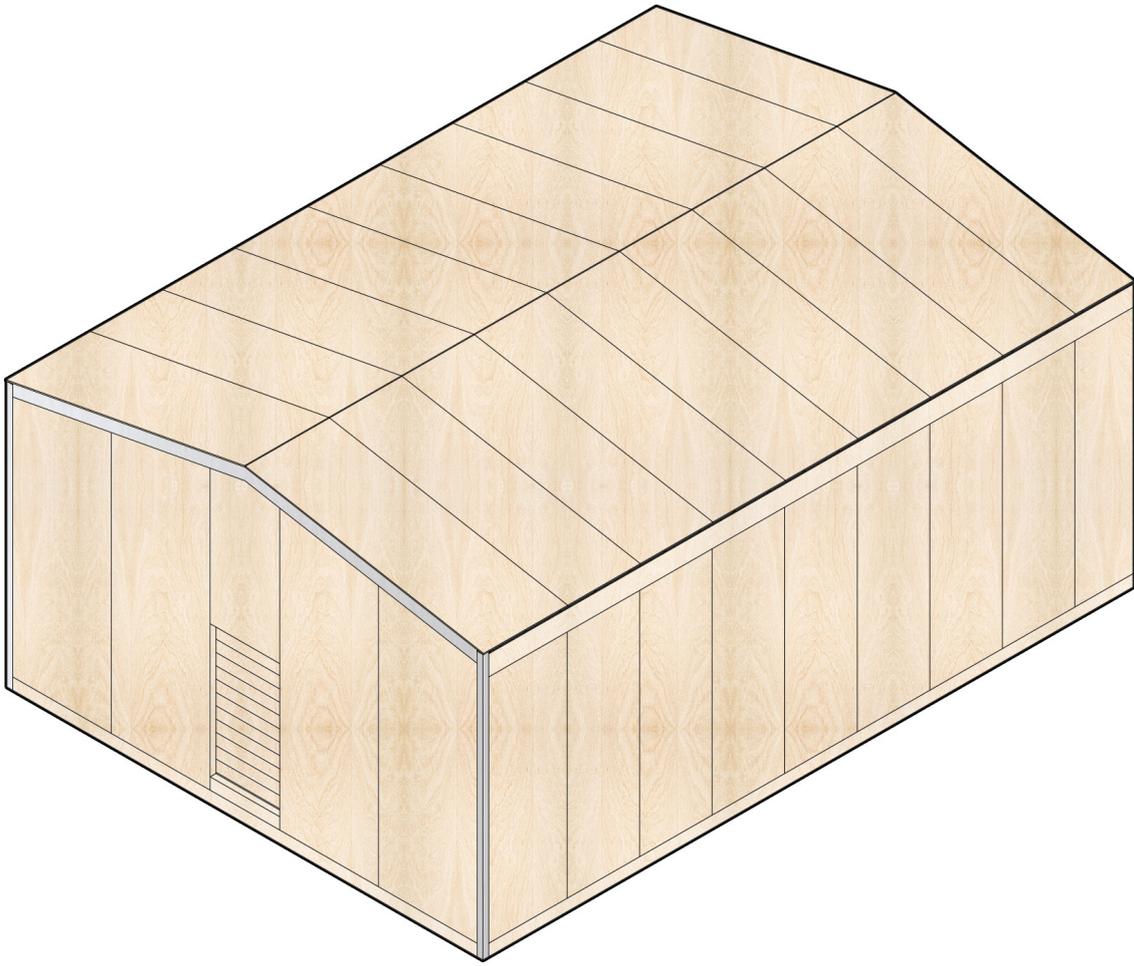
Construction stage 9 laid planks on the battens as the roof finish. Original author
